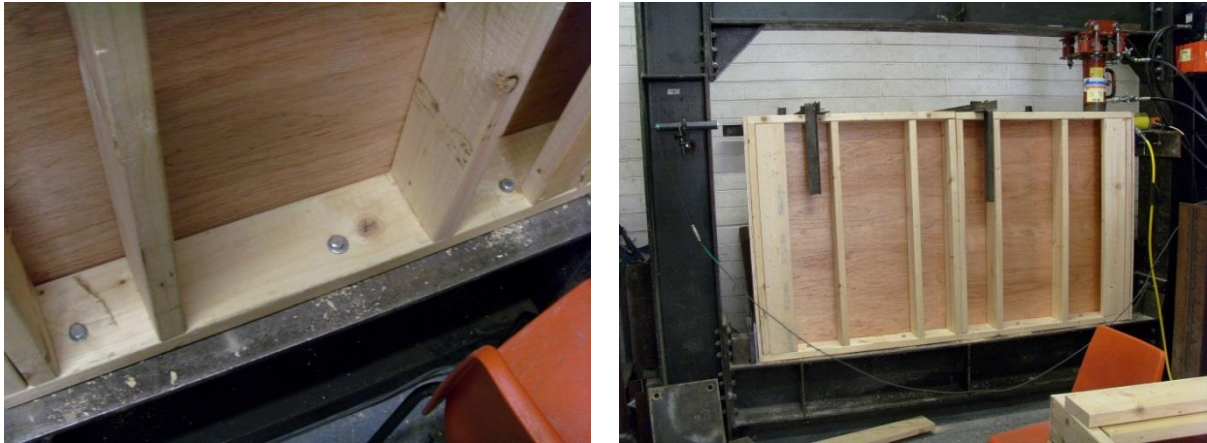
Images showing bolting of wall panels to test rig and guide rails to prevent movement during testing
